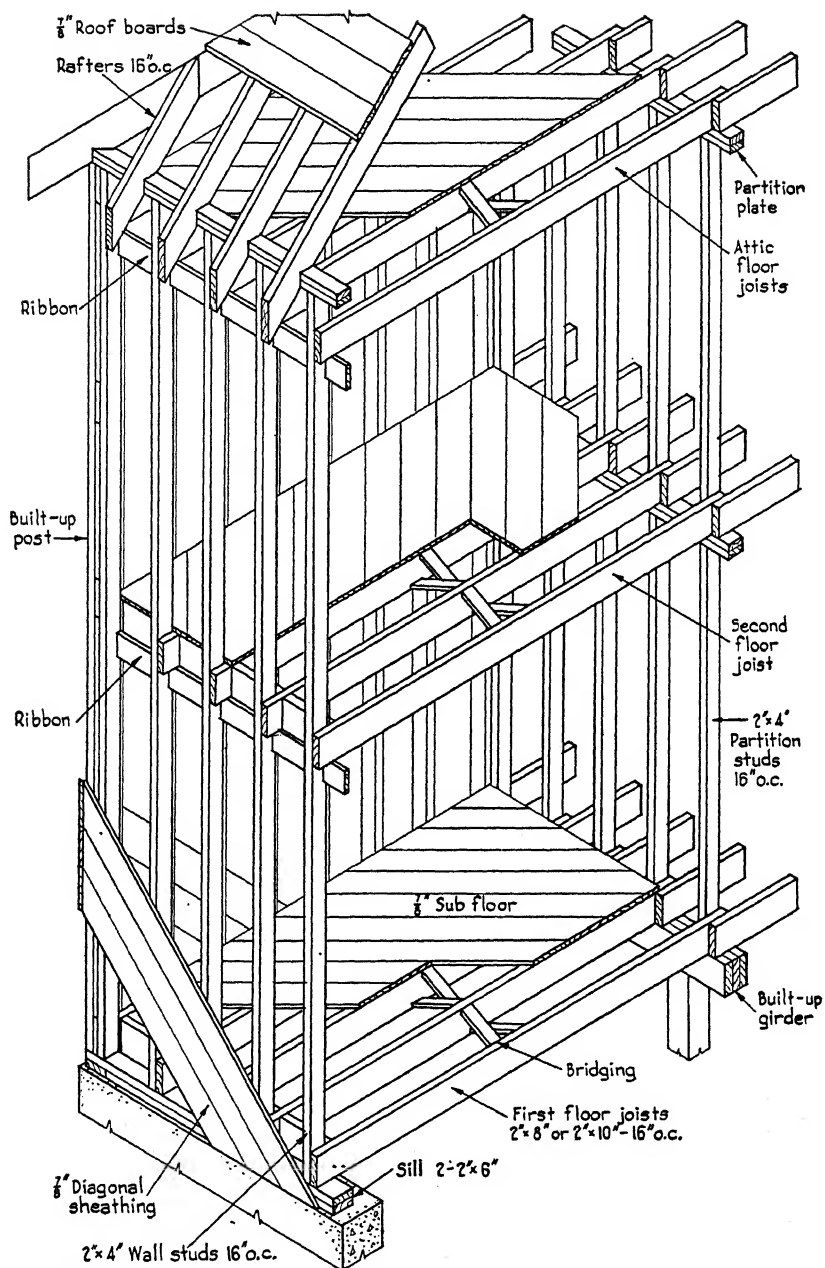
DETAILS, AMERICAN BALLOON FRAME CONSTRUCTION
